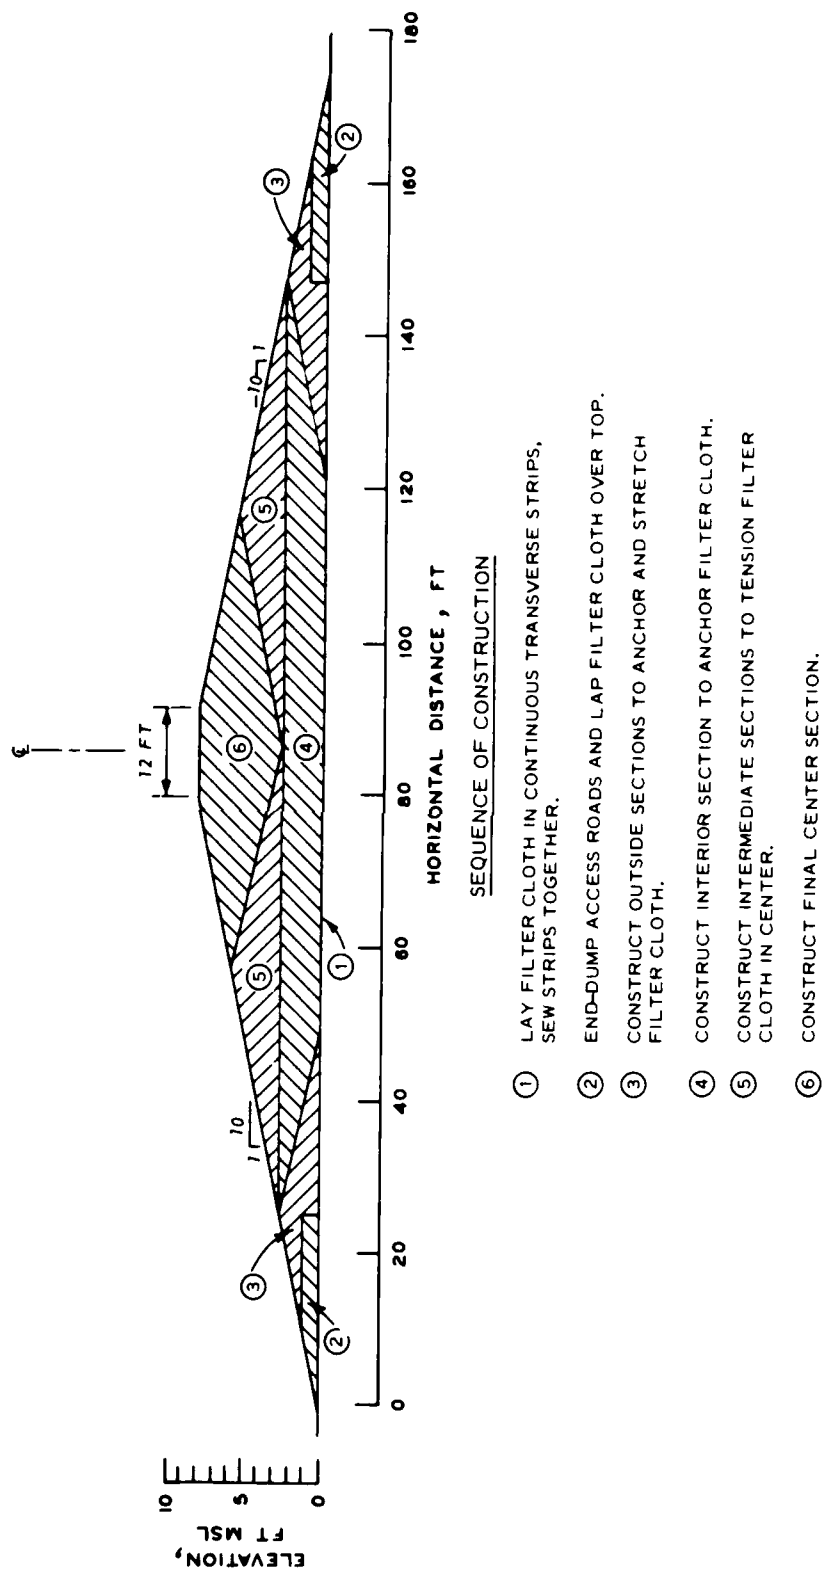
Cross Section and Construction Sequence for Proposed Floating Dike to el 8 Across East and West Ends of Pinto Pass⁹
